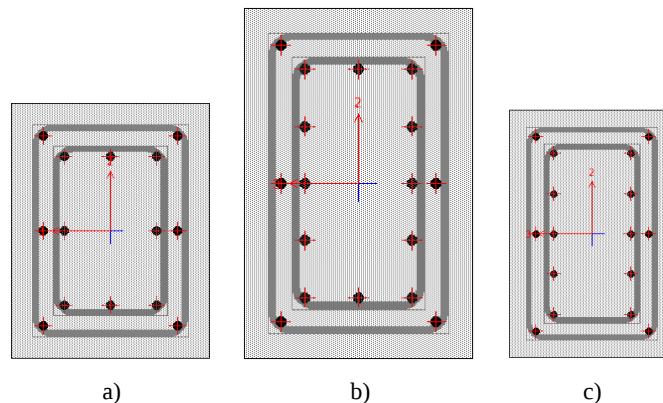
Beam cross-sections after concrete jacketing for (a) B1, (b) B2, and (c) B5
